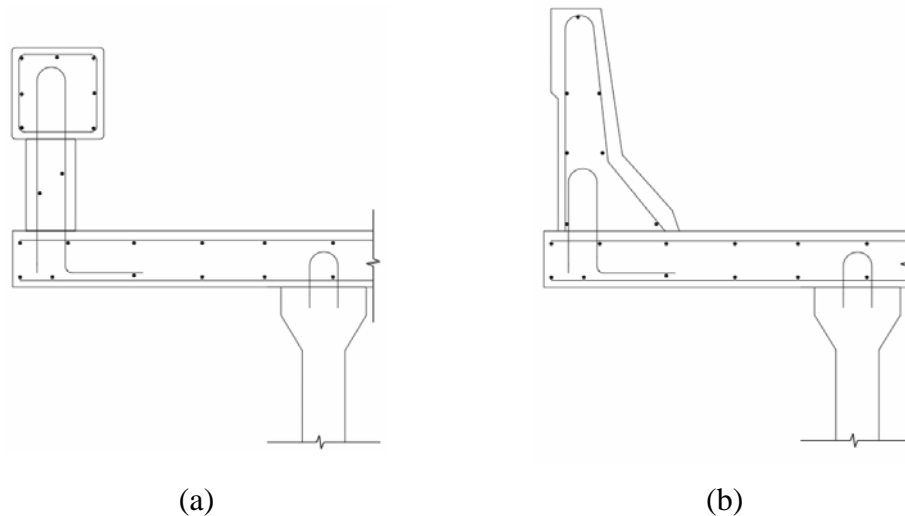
Transverse sections of the (a) T203 and (b) T501 bridge barriers
